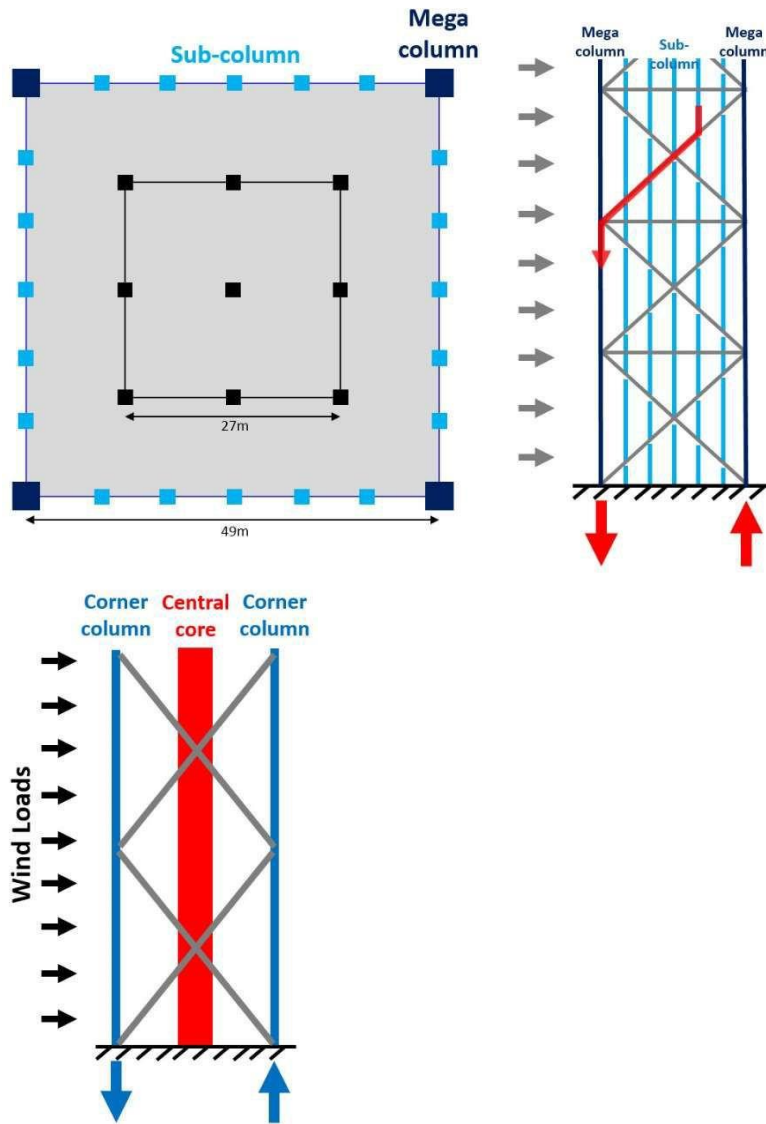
The alternative design examples of lateral structural systems at building perimeter
